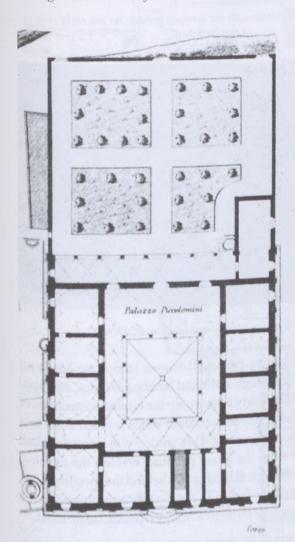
Ground plan of the papal palace of Pjenza and its garden
